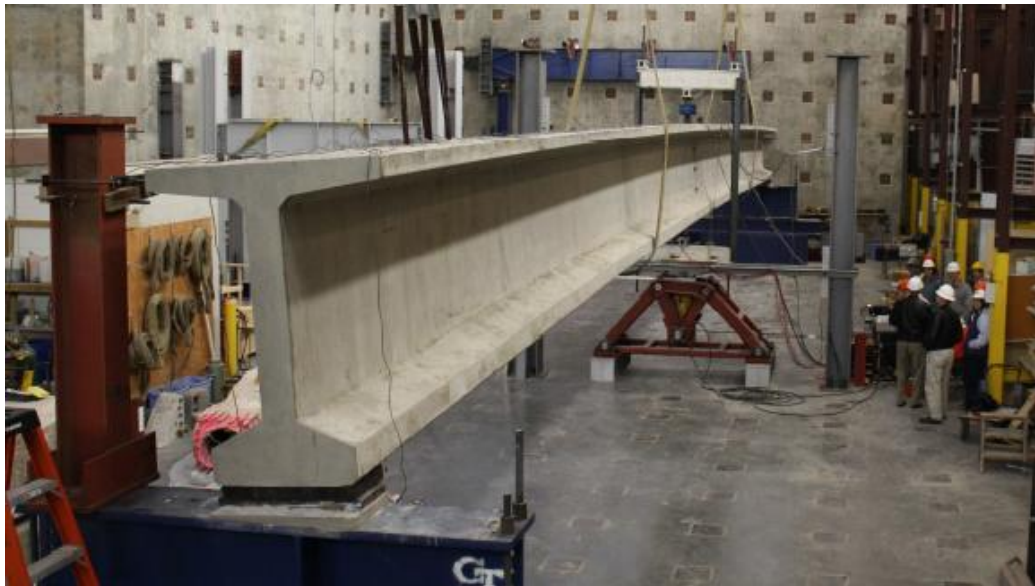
9. Rollover stability test on a PCI BT-54 prestressed concrete beam supported on elastomeric bearing pads. ^[23]
